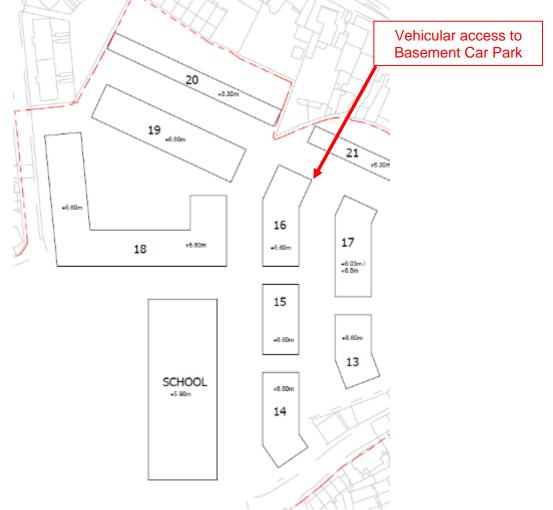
Ground floor FFL Plan: Stag Brewery Component of Site – west of Ship Lane
